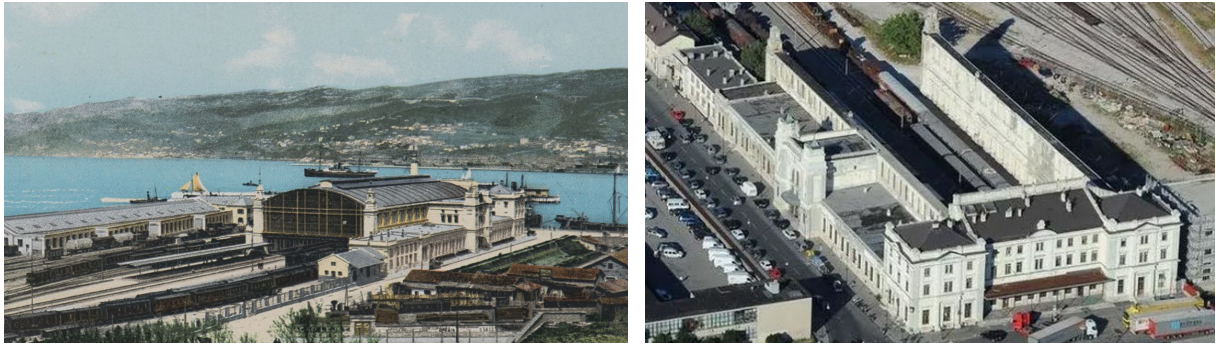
Historical images of the railway station: (a) original layout and (b) building prior to the renovation project.
